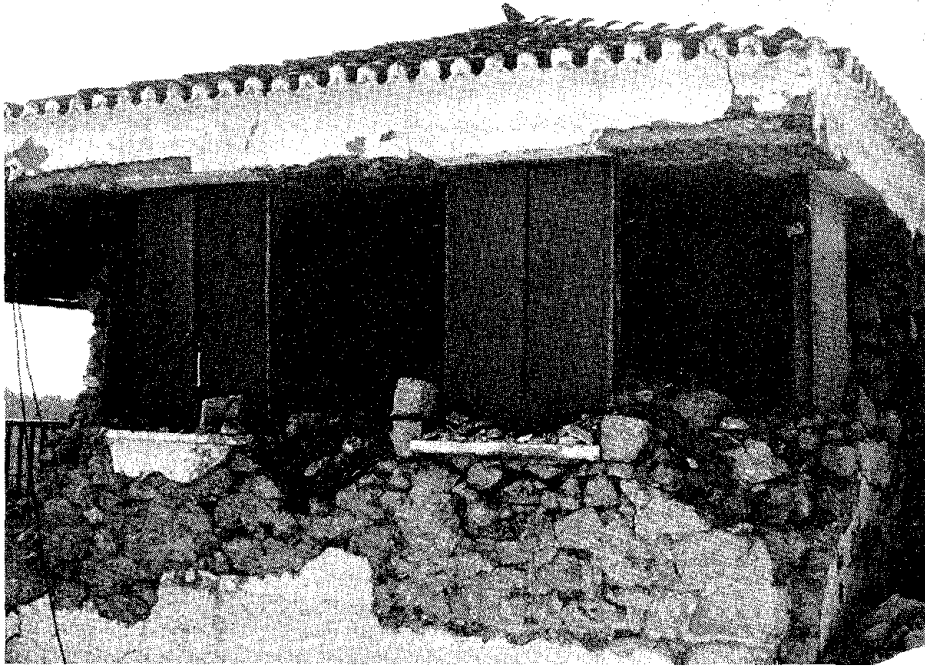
Tile roof supported by timber frame in Perahora.
